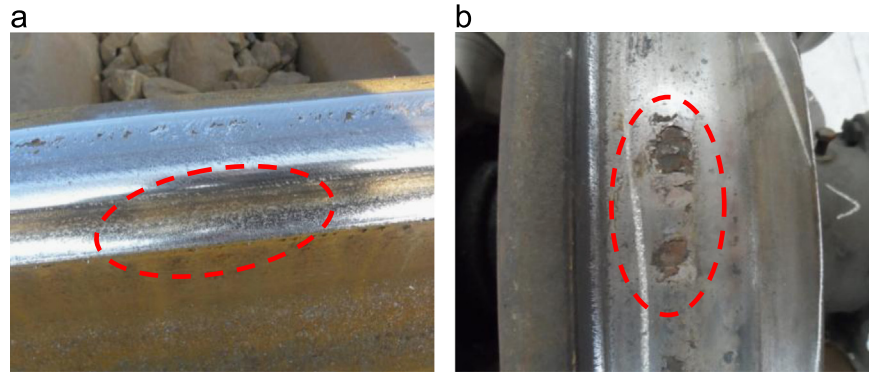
Typical damages of heavy-haul wheel/rail, (a) rail side wear and (b) wheel spalling.
